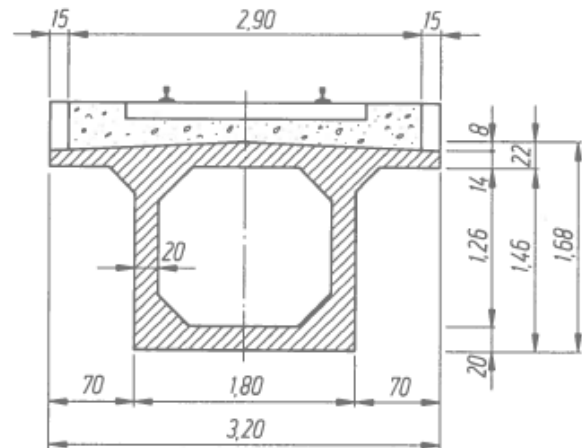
single-celled box girder Japan (span 22,30 m) [U12]
